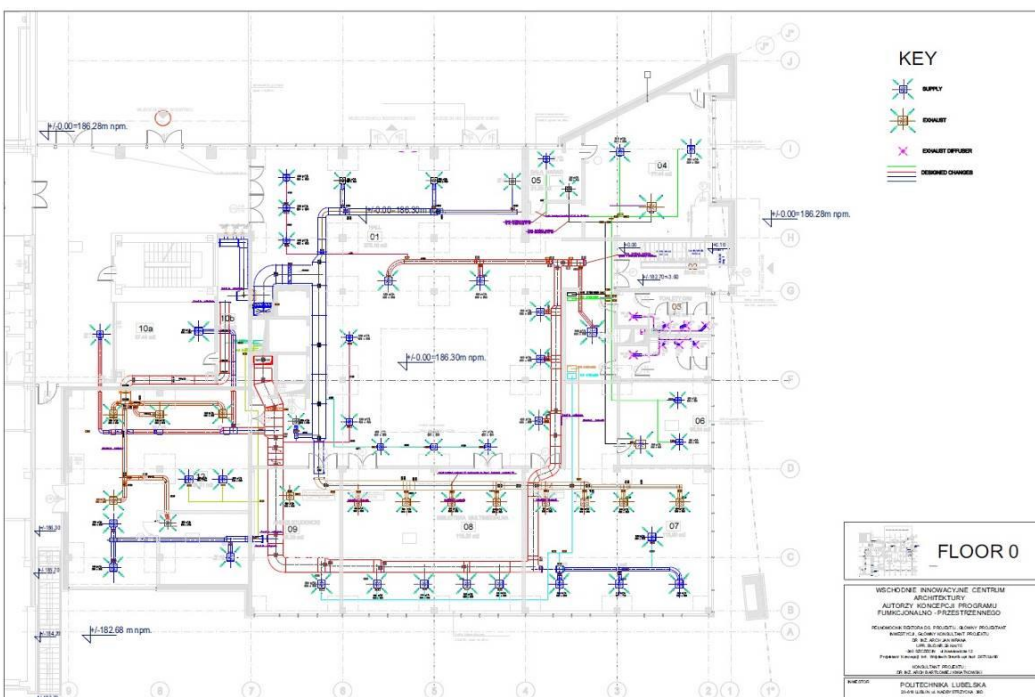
Floor 0 (ground-floor) plan. Source: Lublin University of Technology (the concept).
